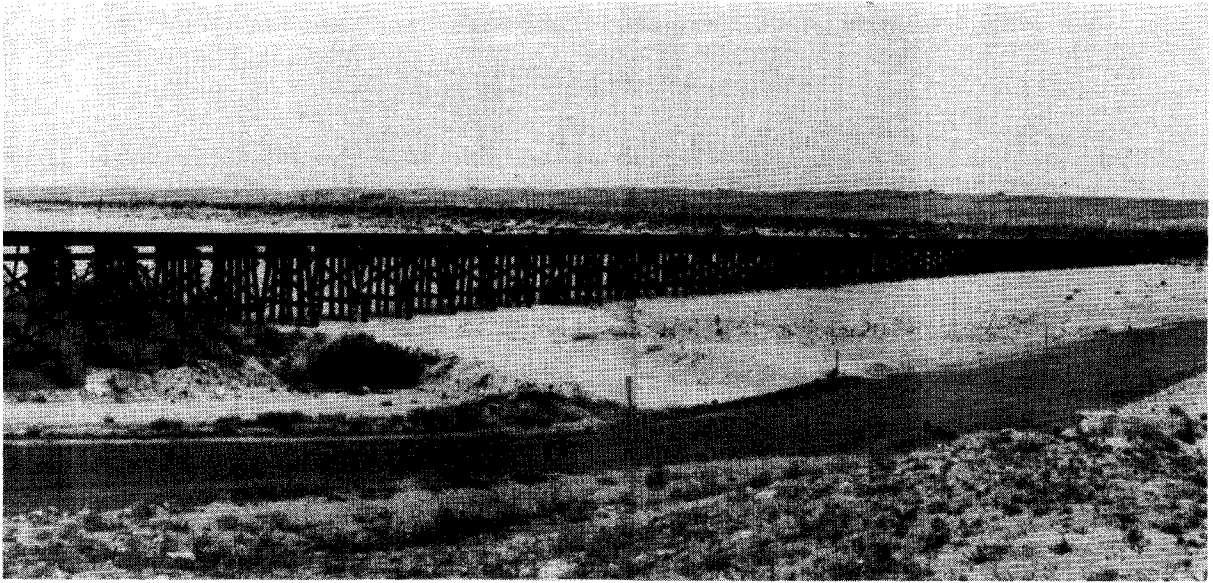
View of upstream side of Atchison, Topeka and Santa Fe railroad bridge at mile 111.07 near Hesperia. Road shown adjacent to railroad is Rock Springs Road.
